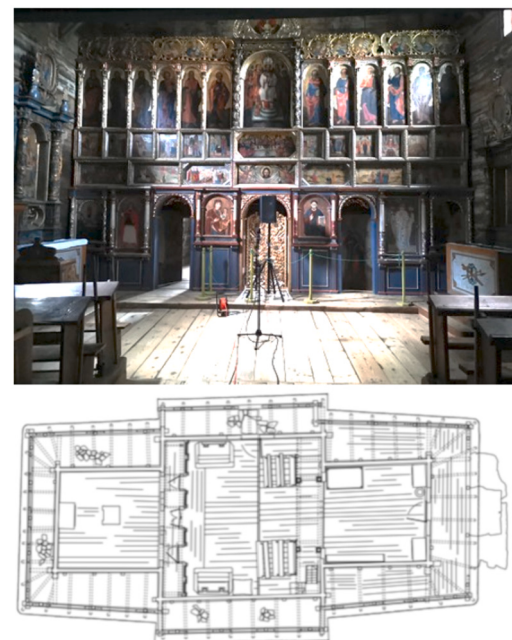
Interior photograph and floor plan of St. Paraskeva Church in Radruż.
